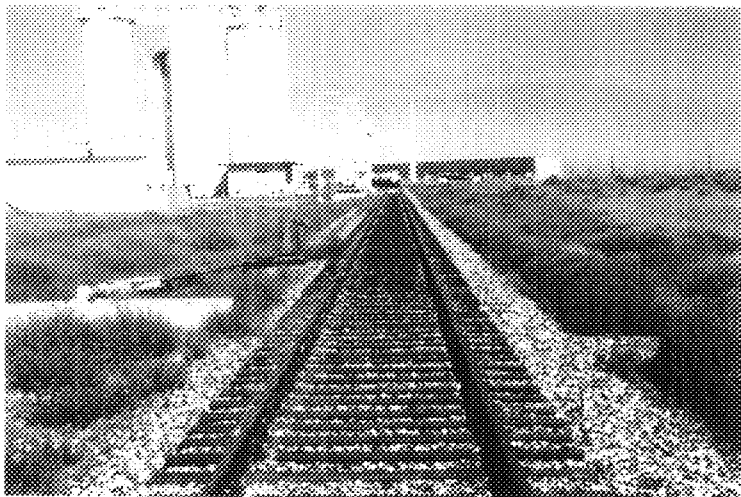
Preferred siding showing car puller on the left and unloading and storage facility in the background.
